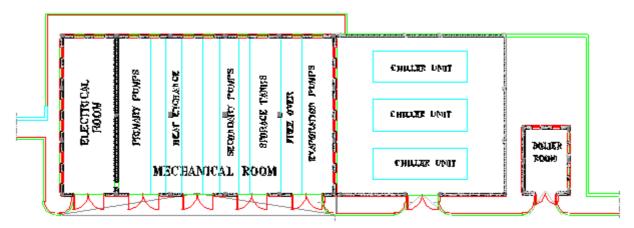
Ground floor of the Technical Building with the space for the need electrical and mechanical infrastructure.
